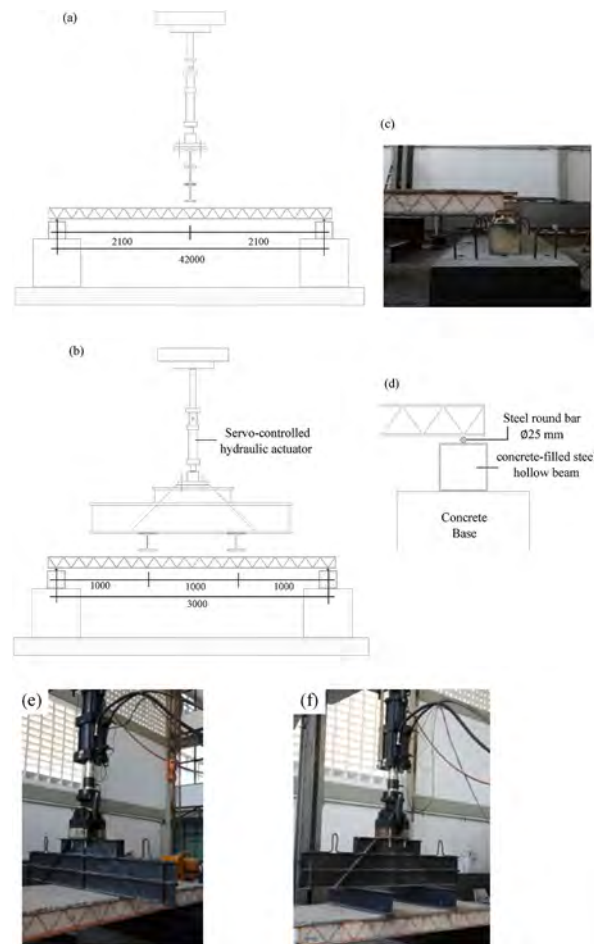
Test setups: (a) elevation view of 3PBT, (b) elevation view of 4PBT, (c) specimen support, (d) 3D detail of specimen support, (e) 3D view of 3PBT, (f) 3D view of 4PBT.
